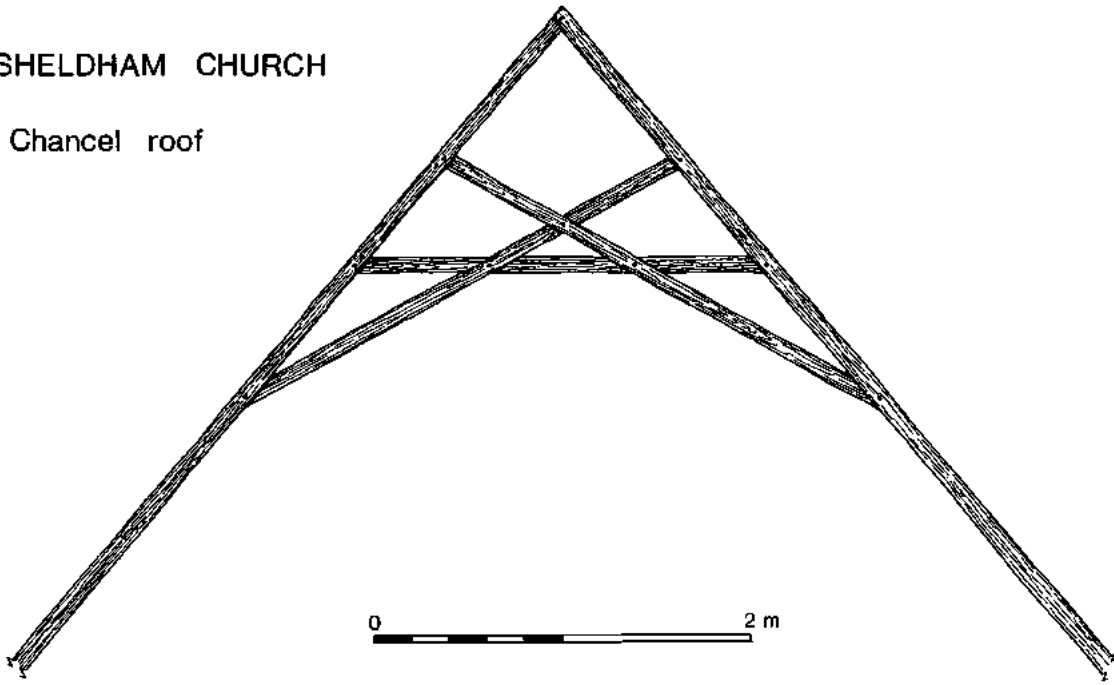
Asheldham church. Scissor-braced roof truss in chancel.
